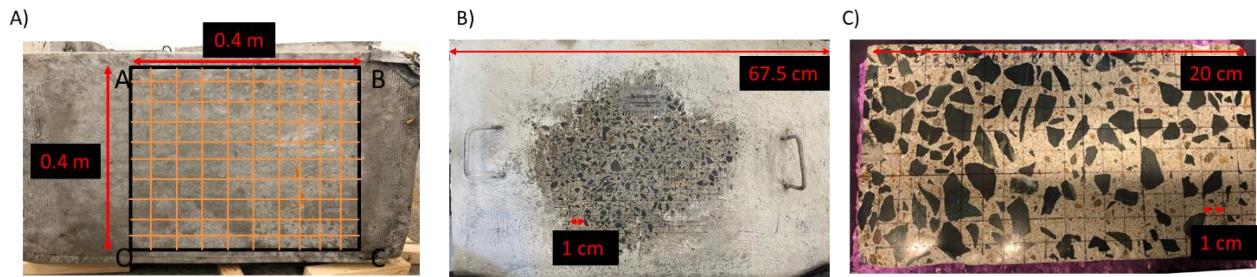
Cracking Index (CI) grid on the surface of concrete block (0.4 x 0.4 m) and the polished section of B) Top surface (450×675 mm) of 2D block and C) 100×200 mm core specimens.
